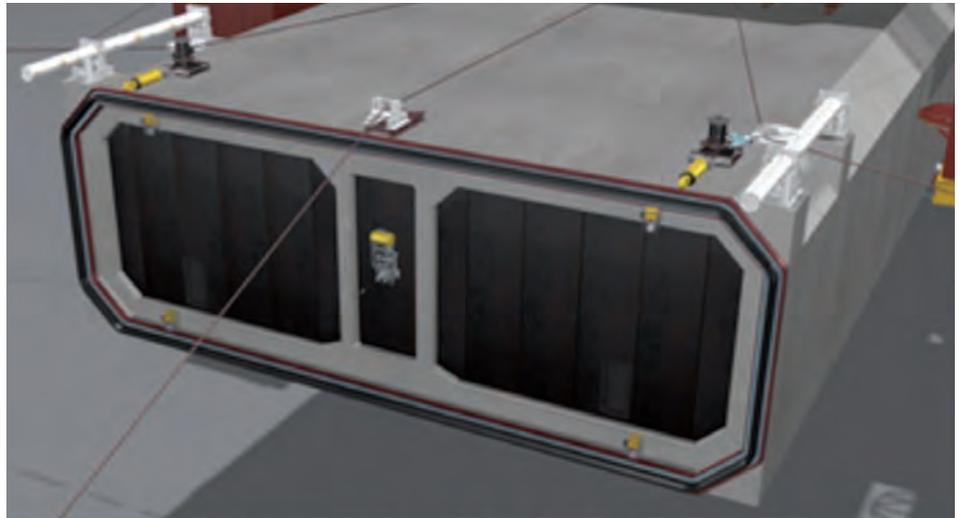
Example of mounted equipment (bulkhead, pins, fairlead, etc)
